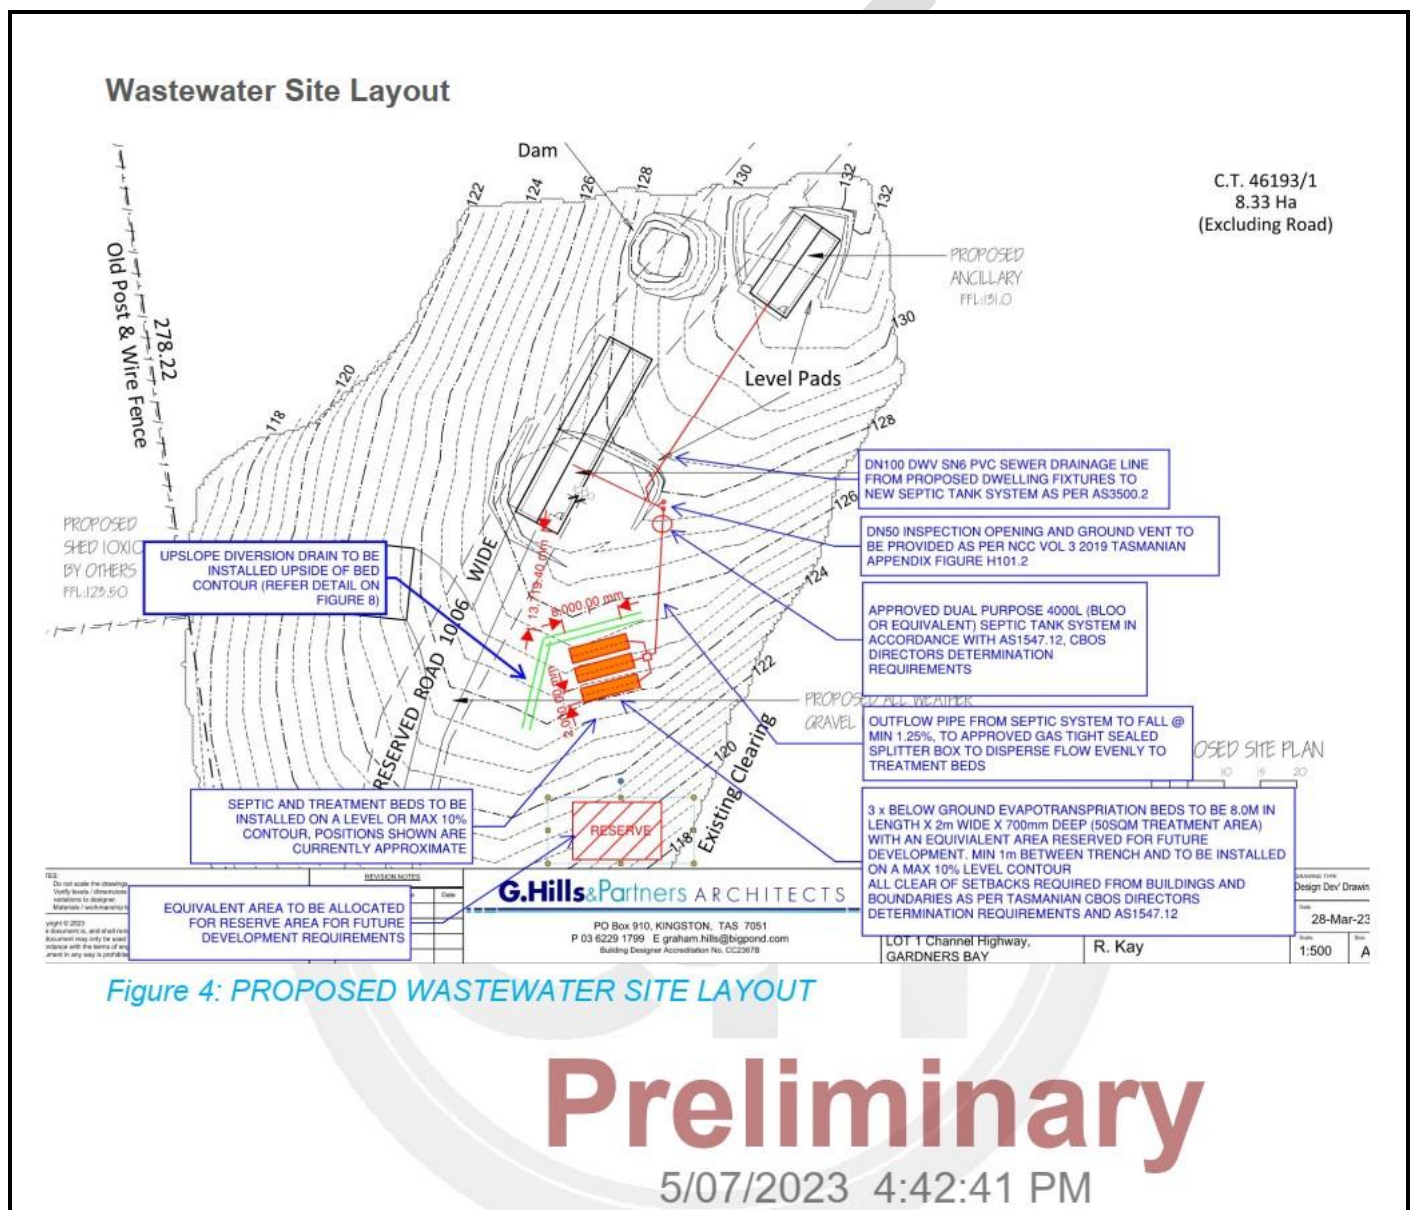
Preliminary site plan of proposed wastewater system and below ground evapotranspiration beds Ref: On-site wastewater Report – Lot 1 Channel Highway, Gardners Bay, Ref CKD-HYD-101 05/07/2023 Preliminary.
